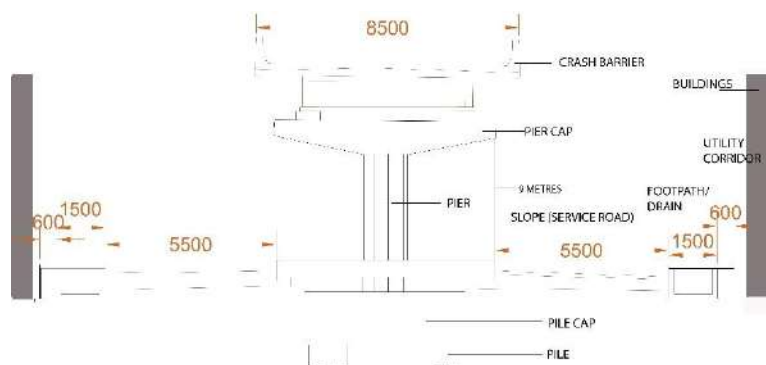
Section with road cross- section and Column , for two-lane double decker flyover on Site(Author).
